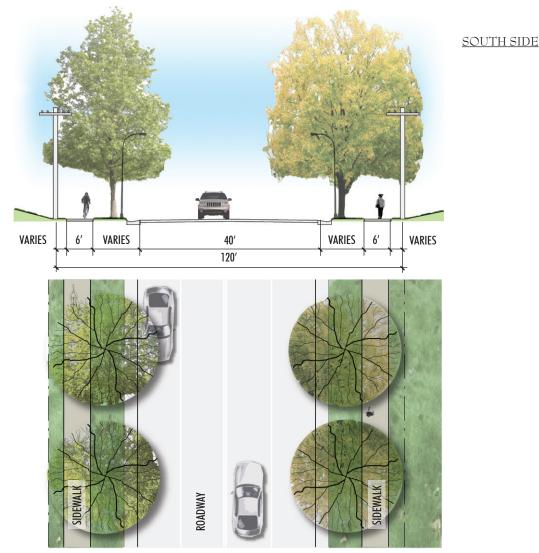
Eastern Parkway: Zone 2 Existing Conditions Section and Plan
